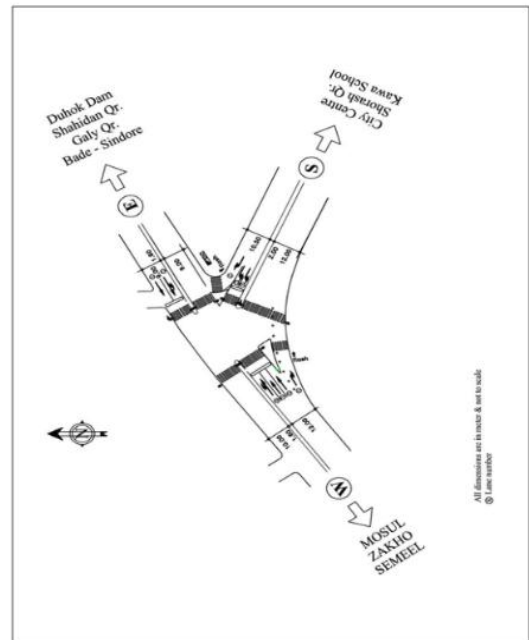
Kawa Intersection (K) Plan (Directorate of Traffic, Traffic Engineering Department, Duhok City, 2009)
